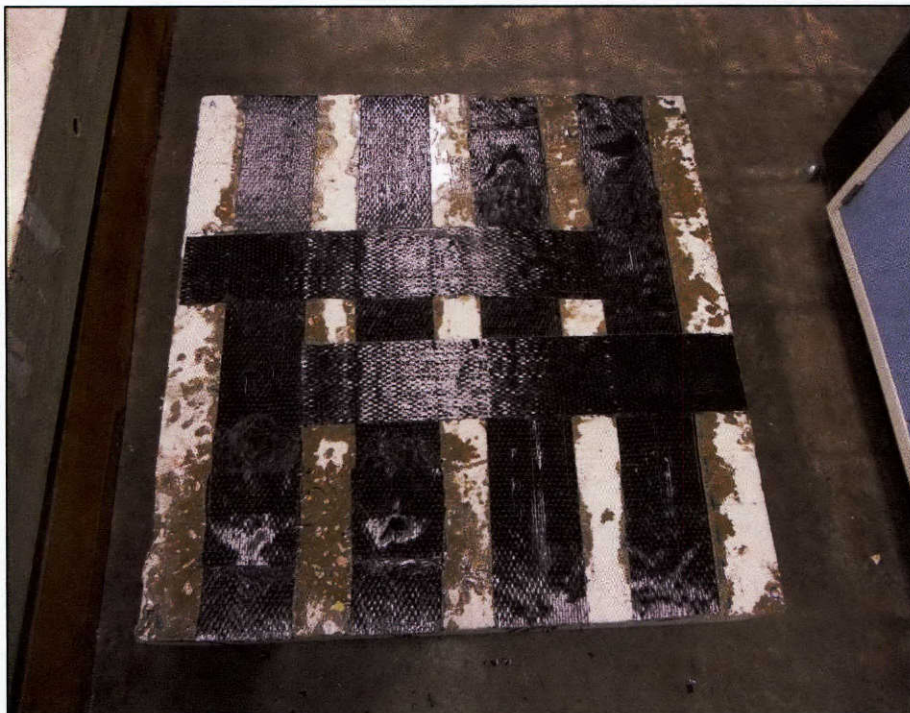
Concrete slab after installation of CFRP strips and anchors
